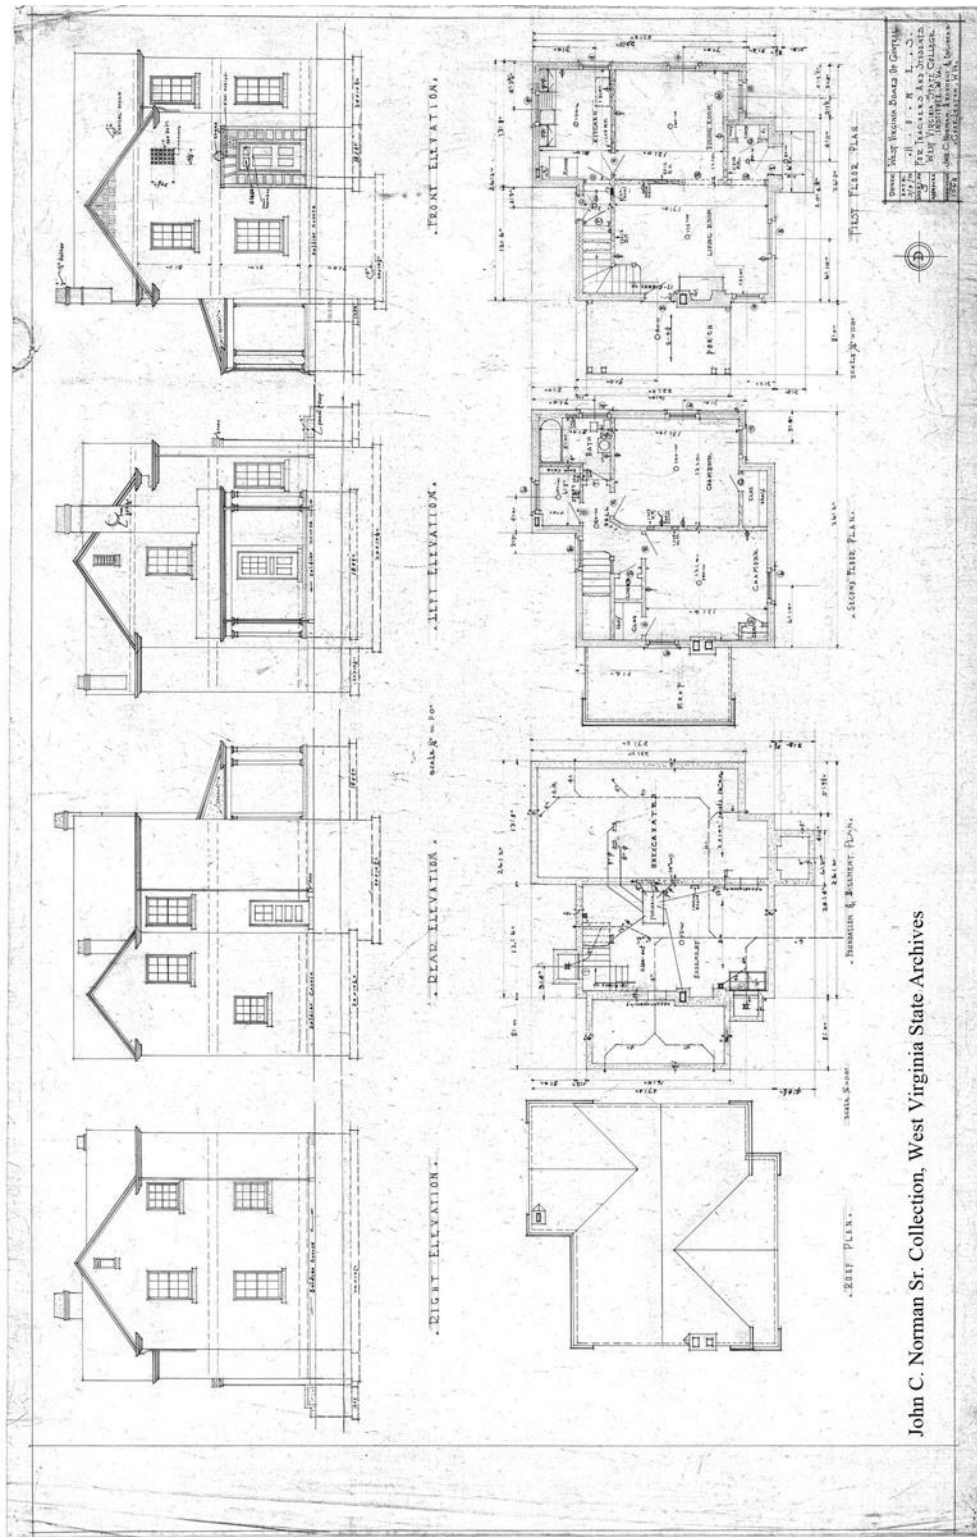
Faculty House D Floor Plan, Courtesy of the West Virginia State Archives, John C. Norman Sr. Collection
